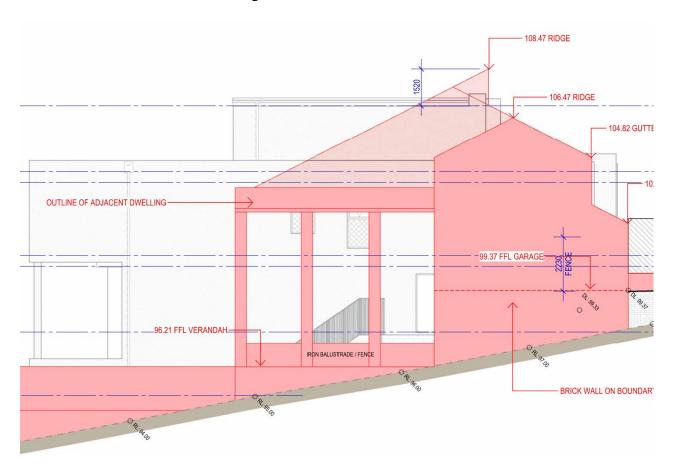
showing the southern elevation outlines of 100 Davenport Terrace in red and the outline of the proposed dwelling at 98 Davenport Terrace
